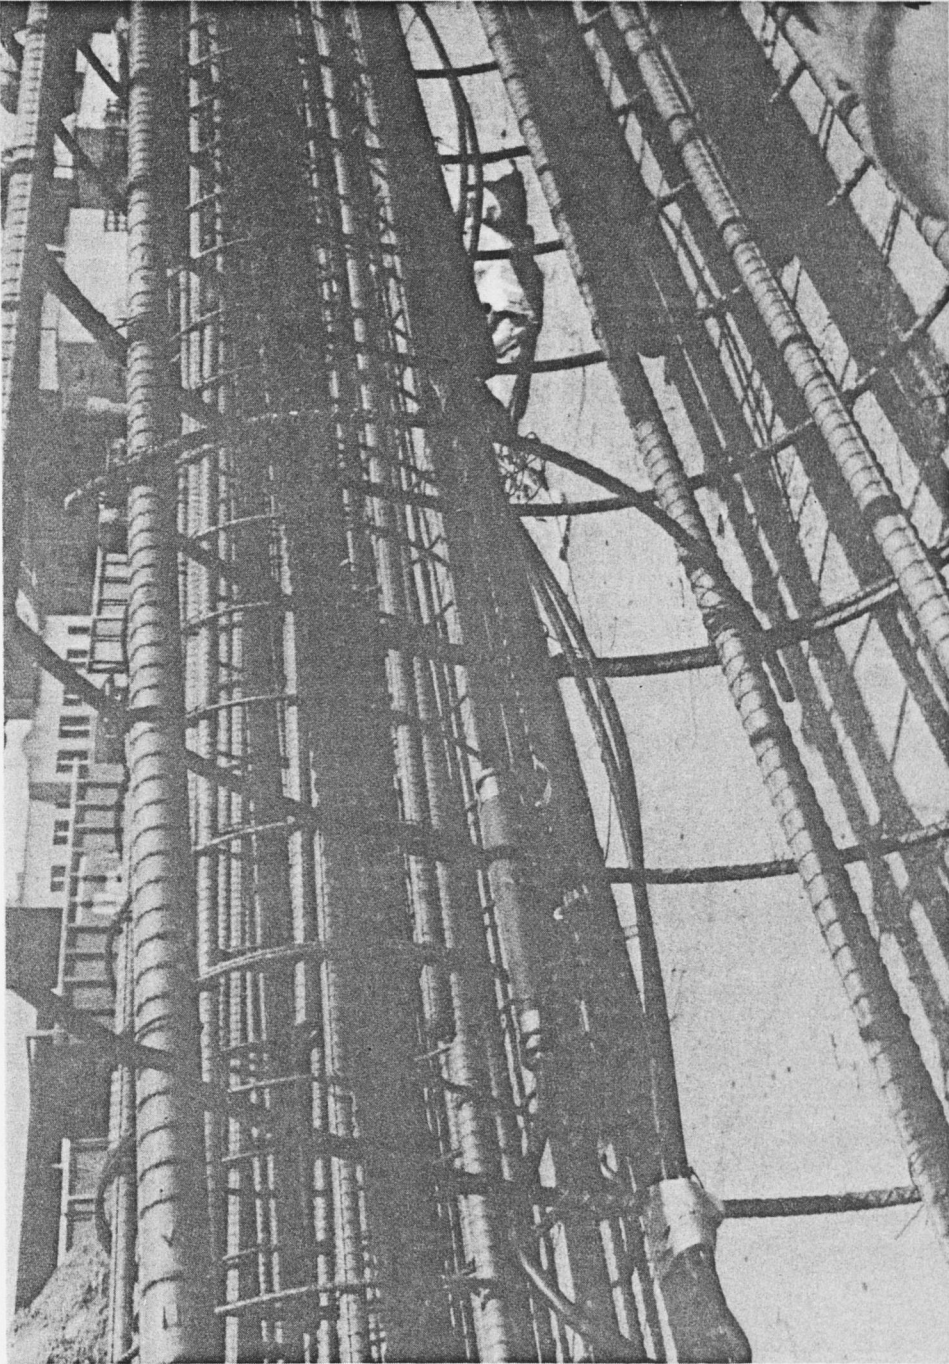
REINFORCING BAR INSTALLED ABOVE STRAIN GAUGE
